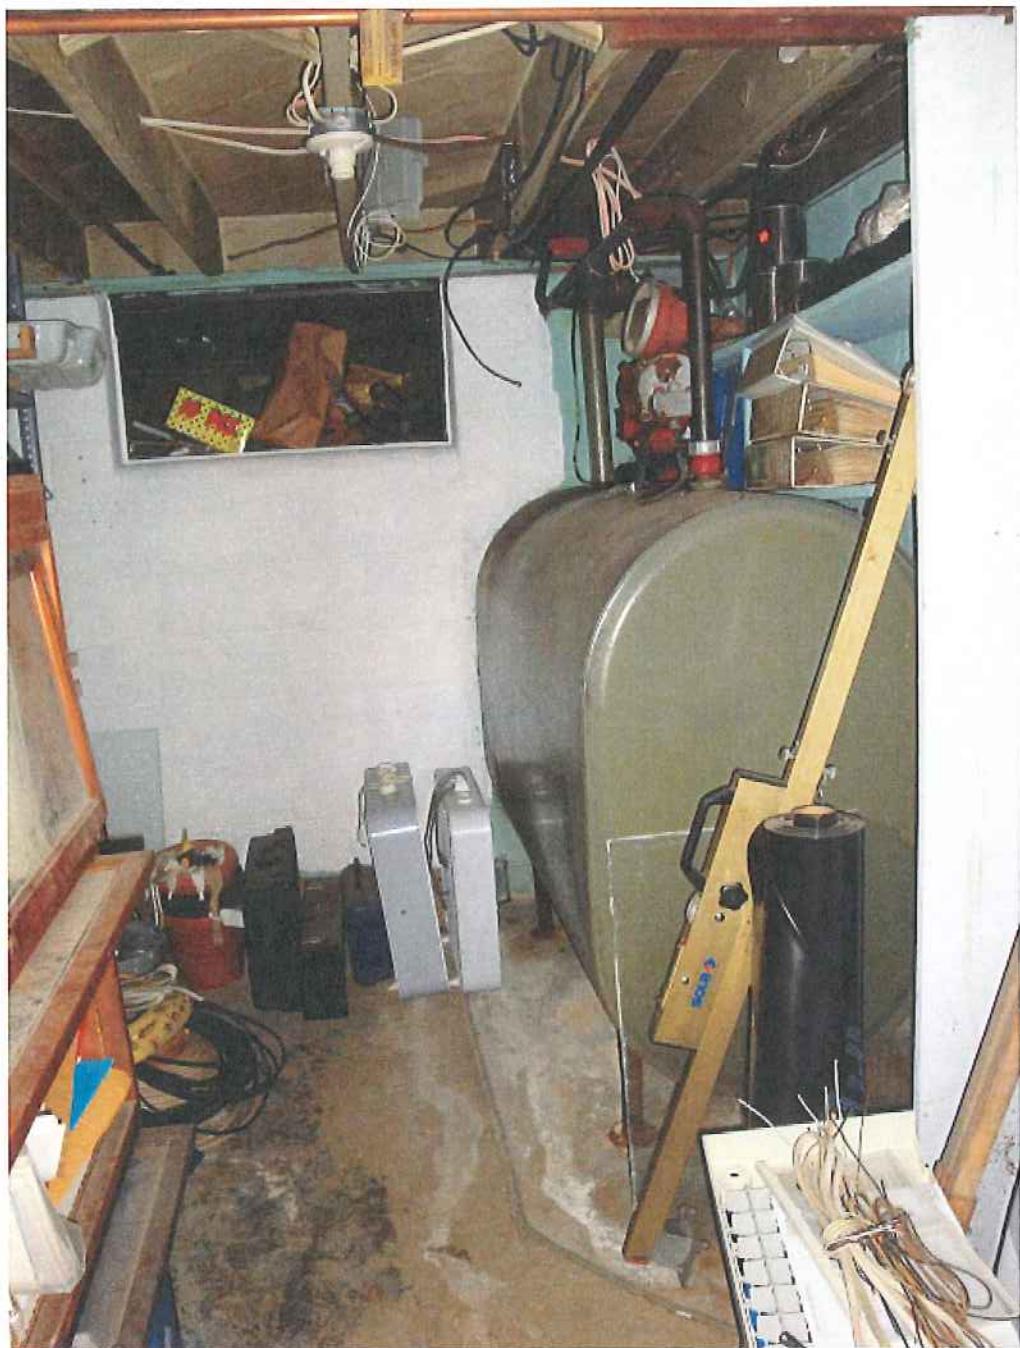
View of heating oil tank located in the basement of 11 Hillside Road.
